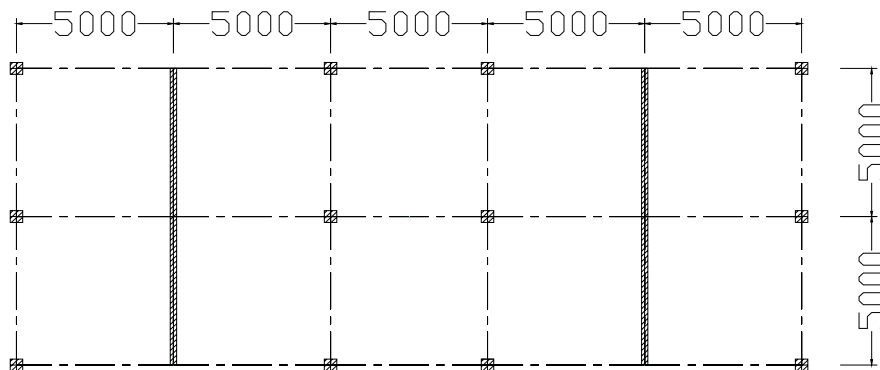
Shear walls are placed at 7.5 m far from the centre of mass of the building in the short direction on both sides
